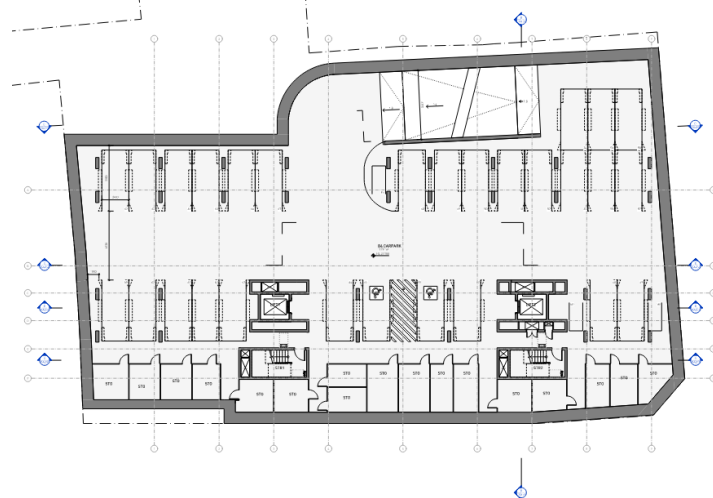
| Mark-up of the pedestrian link from the carpark to the building required to be accessible |Source: Smart Studio Design architect B4
